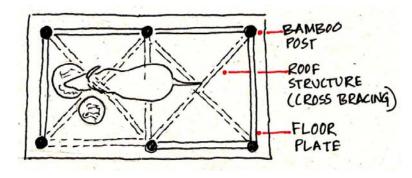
Plan of a cow and goat shed showing cross bracing on roof (Source: Author 2013)
